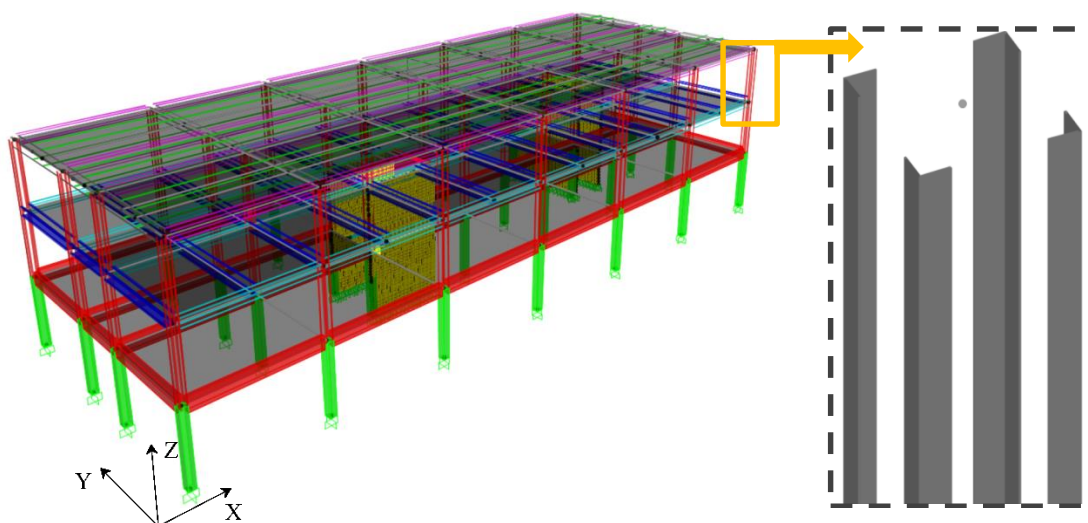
View of the SM finite element model of the structure and detail of an equivalent frame element adopted to schematize the reticular columns
